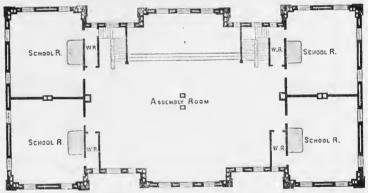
PLAN OF FOURTH STOREY OF DESIGN NO. 57.
